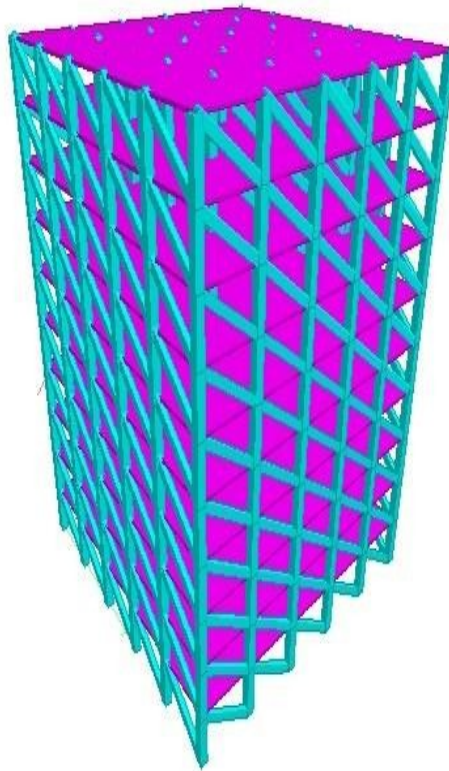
Isometric view of flat slab building having 50% infillwalls
